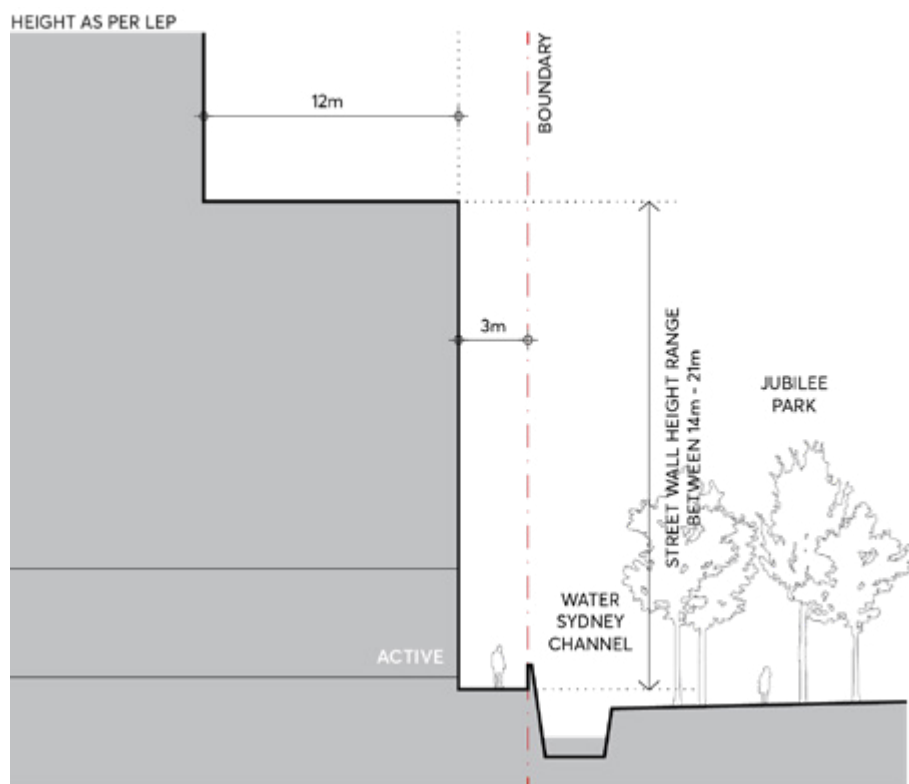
Jubilee Park Edge (Section F) Setbacks and Street Wall Height
